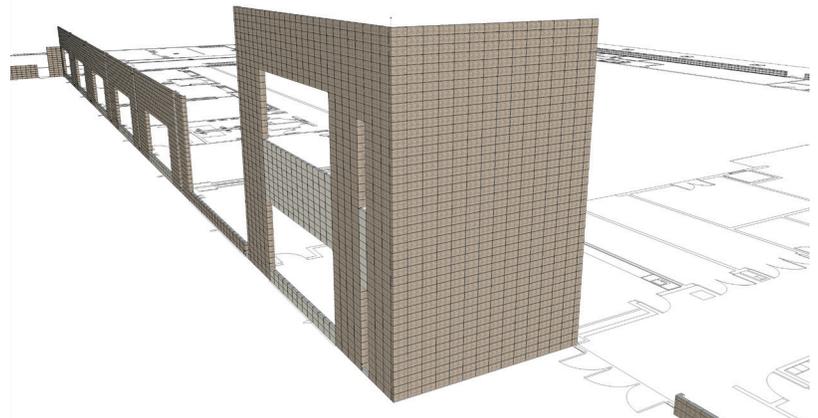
St. Augustine 3D model showing Burnished CMU layout and type
